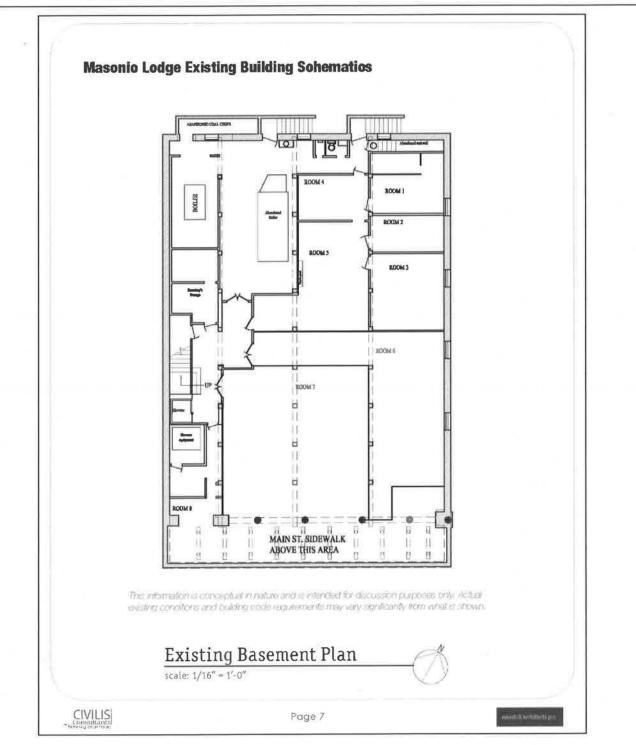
Existing Basement Floor Plan, taken from emerick architects' Adaptive Reuse Case Study. See Bibliography.
